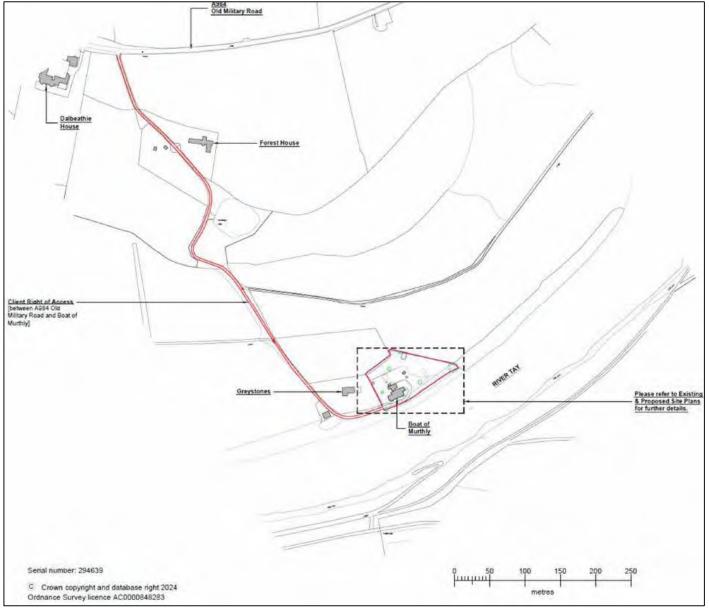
Location plan (excerpt from Drawing BOM-SAB-DH-XX-LP-A-0101_P03 see Plans section)
